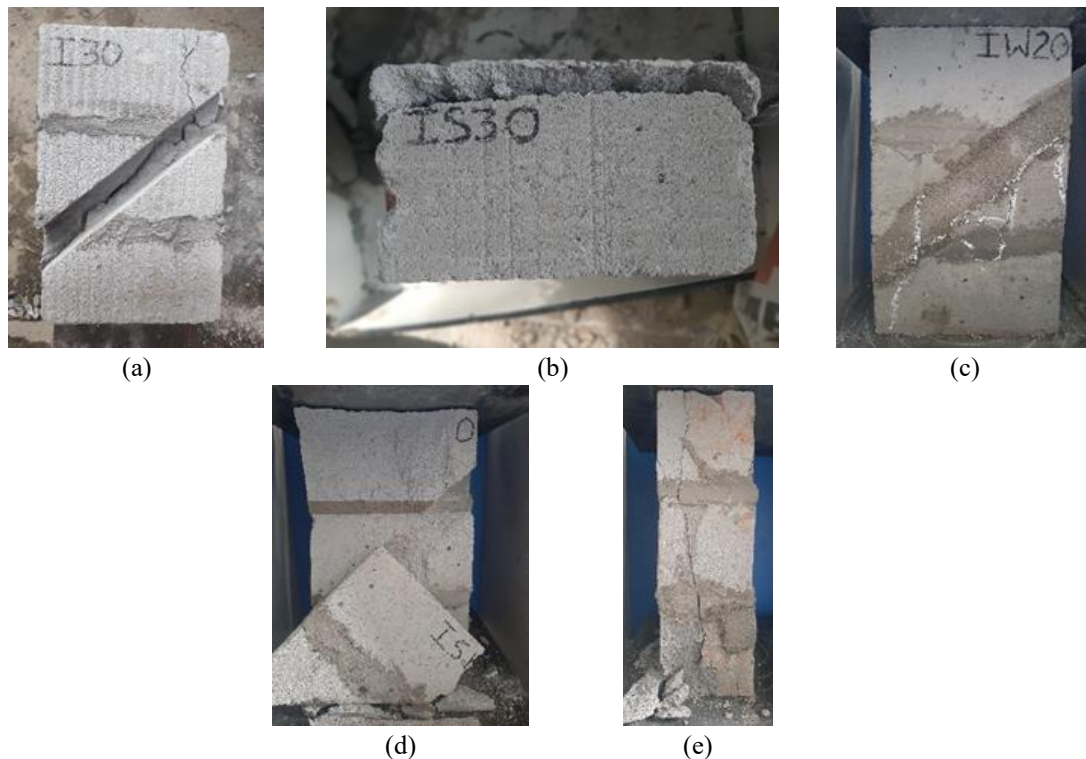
Failure pattern of specimens with inclined chases (a) Crack along chase I30, (b) Face shell separation IS30, (c) Cracks along the chase IW20, (d) Face shell separation IS20 and (e) Vertical crack and toe crushing IM20
